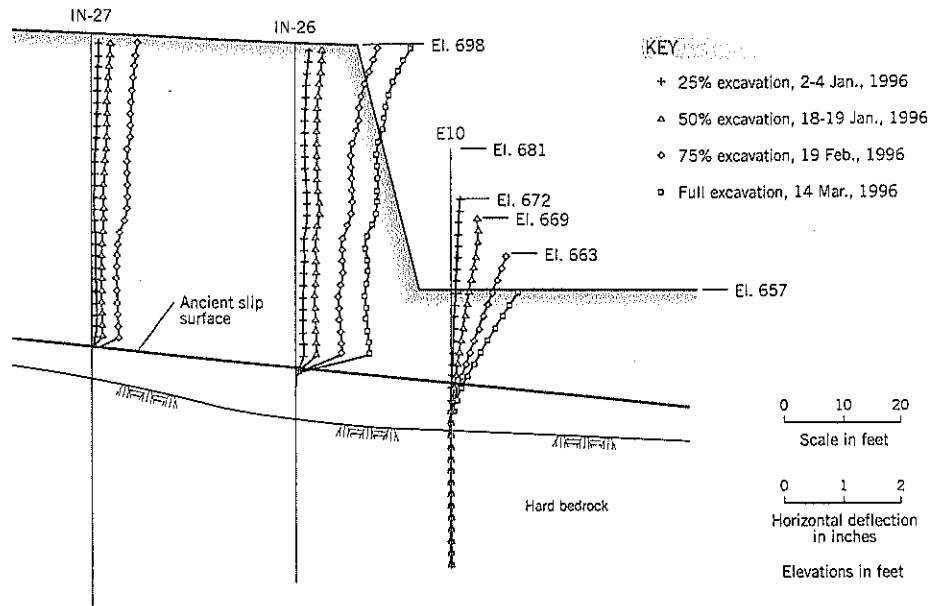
Washington Park Station. Movements of the ground on the north side of the East Pit during excavation (Section Y-Y).
